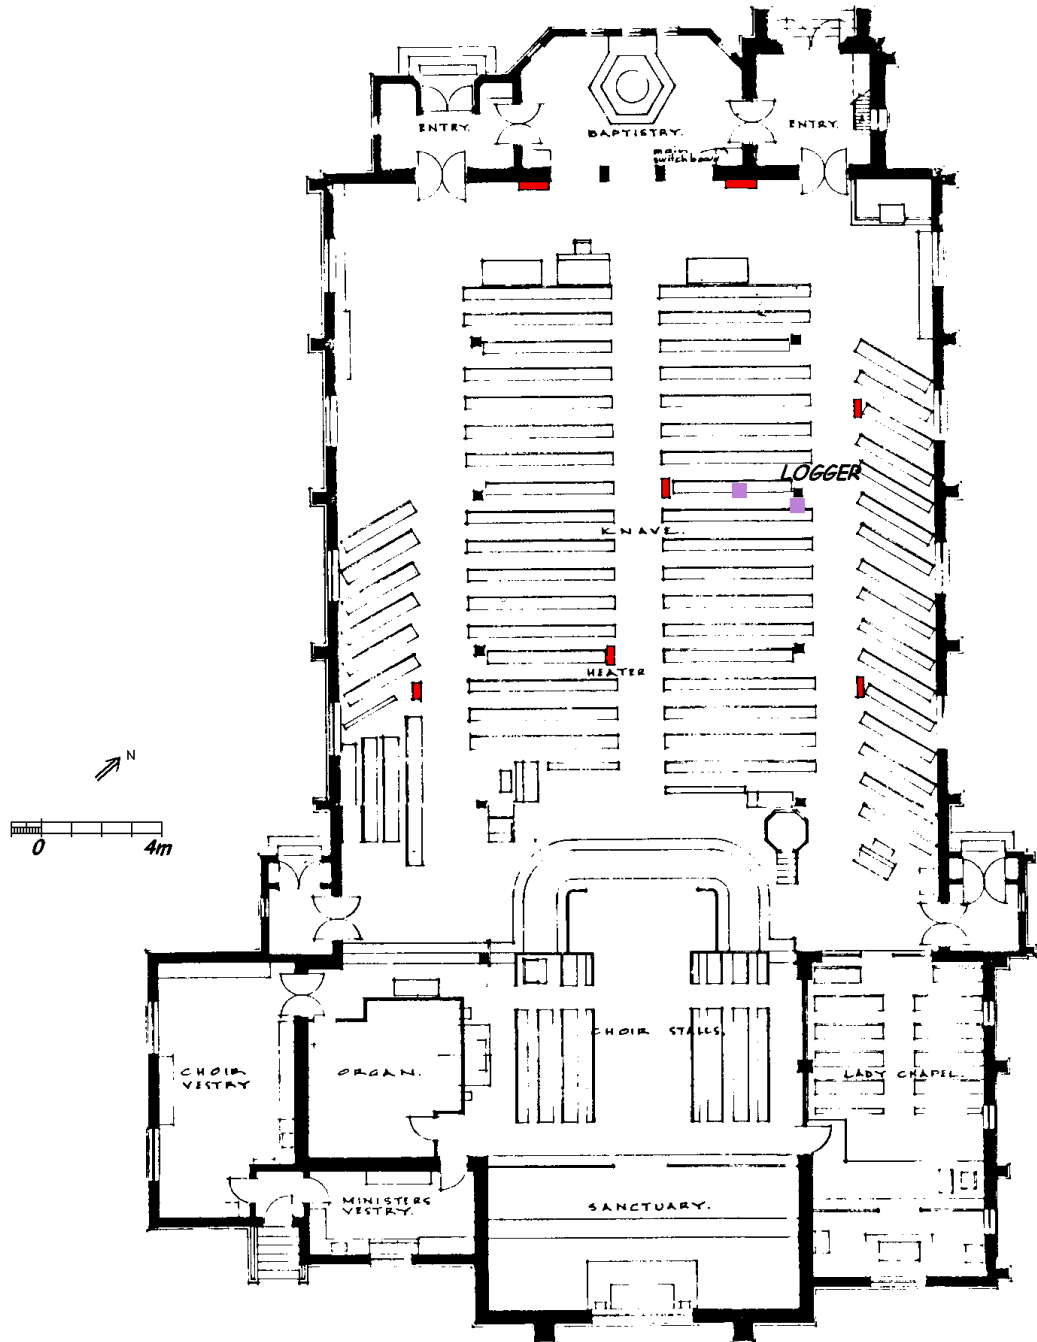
Plan view of All Saints Church (scale 1:250)
